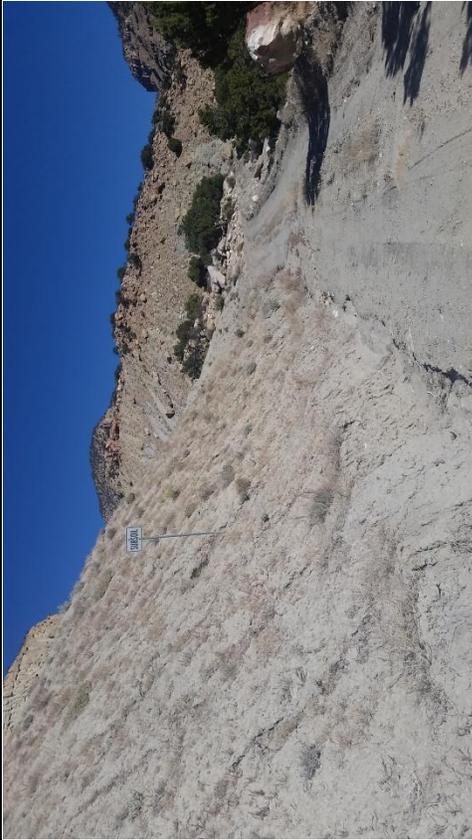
SUBSOIL STOCKPILE, WASTE ROCK SITE
